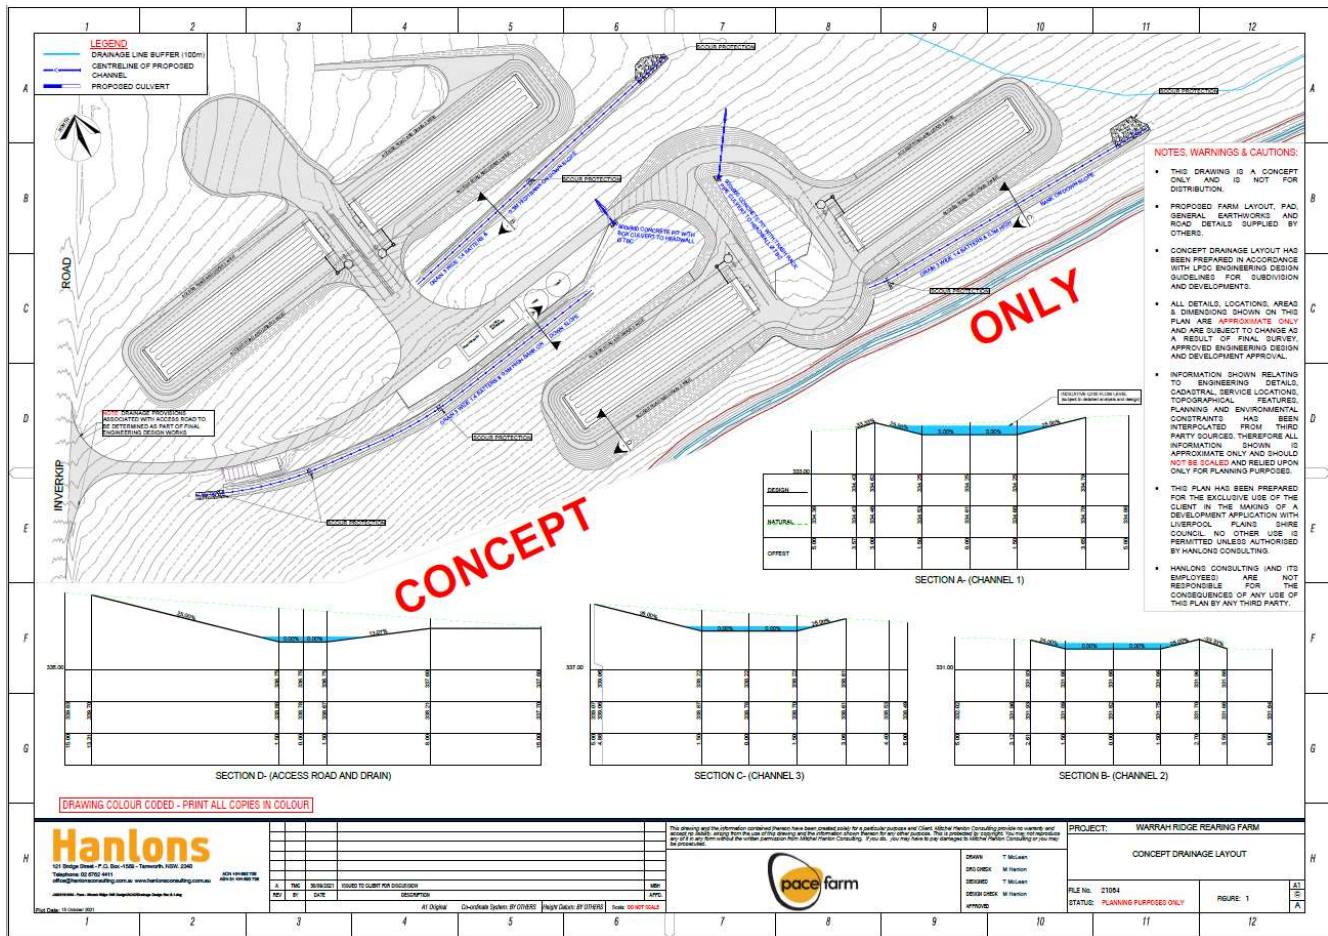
Concept Drainage Layout (Hanlons Consulting, 2021)
